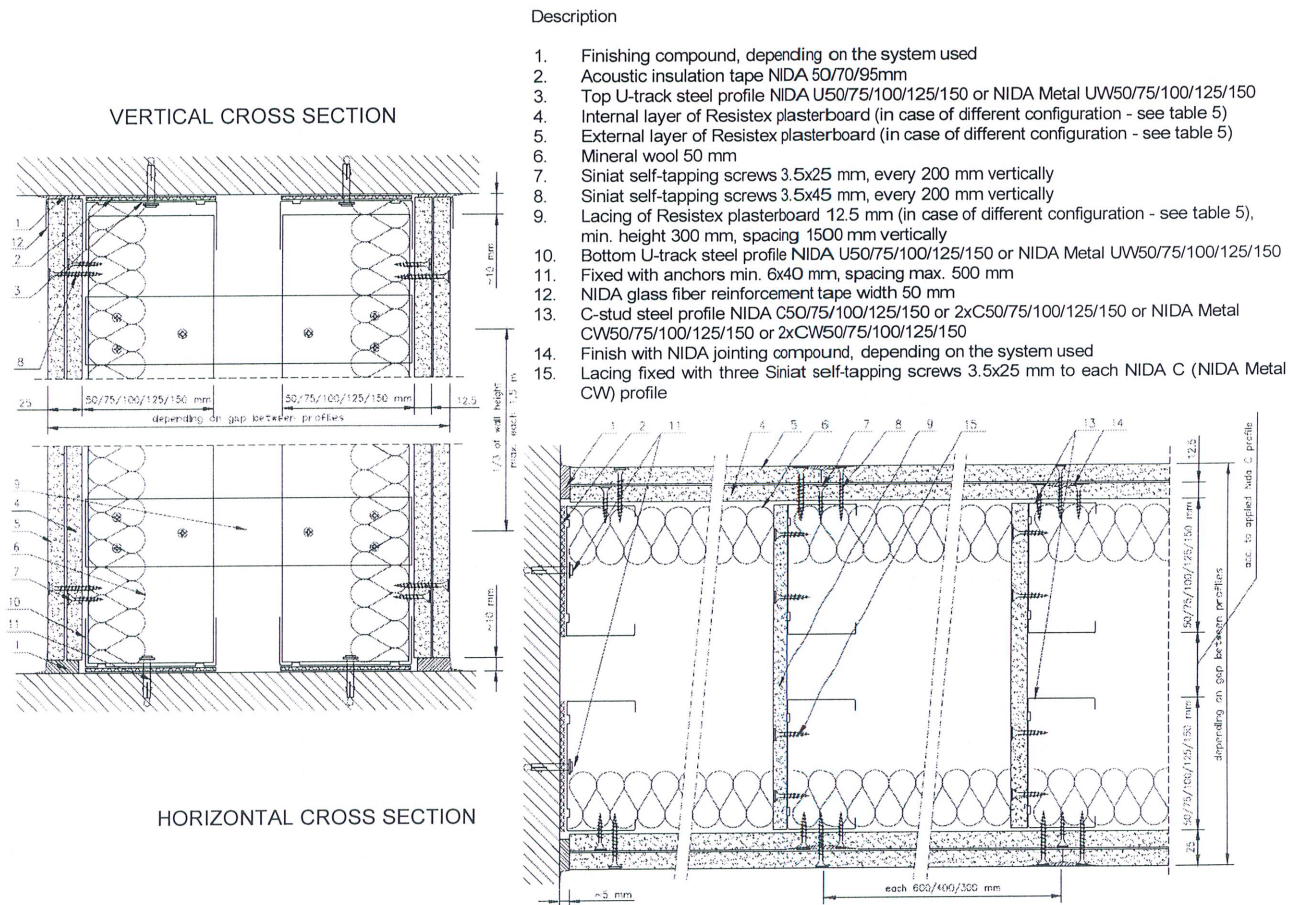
Vertical and horizontal cross-section of anti-burglar non-loadbearing partition wall with double framework and two layers of boards – for installations.
